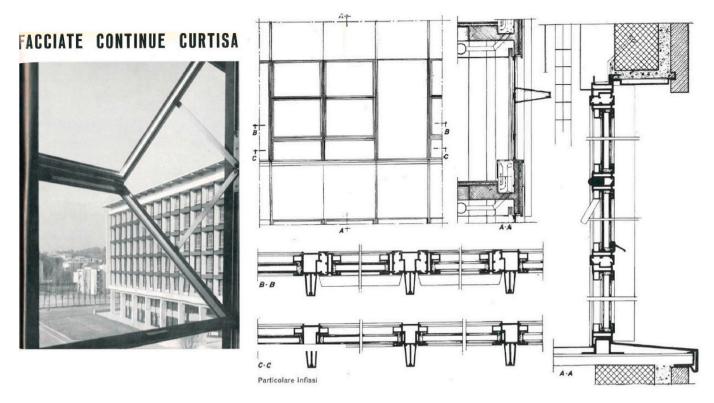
The window book-opening system developed and patented by the Curtisa façade builder.
